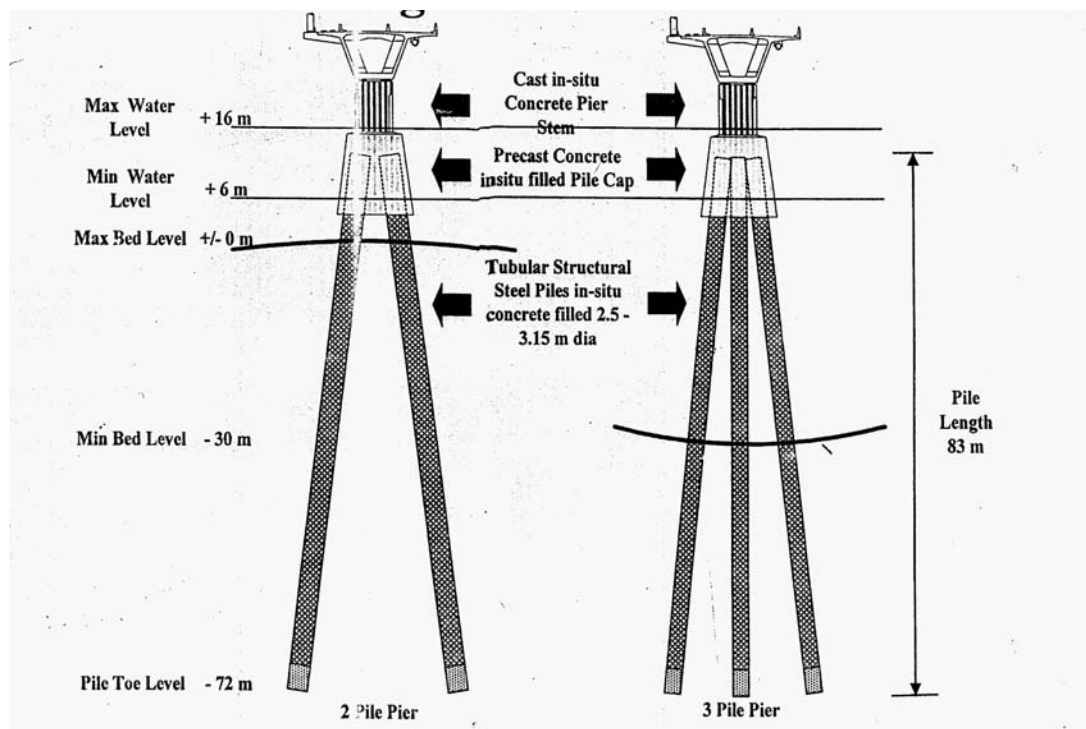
(d) Jamuna Bridge: Substructure and Foundation
